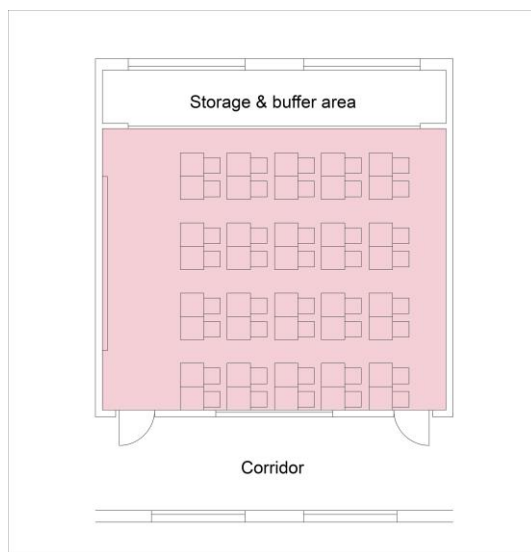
Plan of classroom with buffer area at north to support improved air exchange
